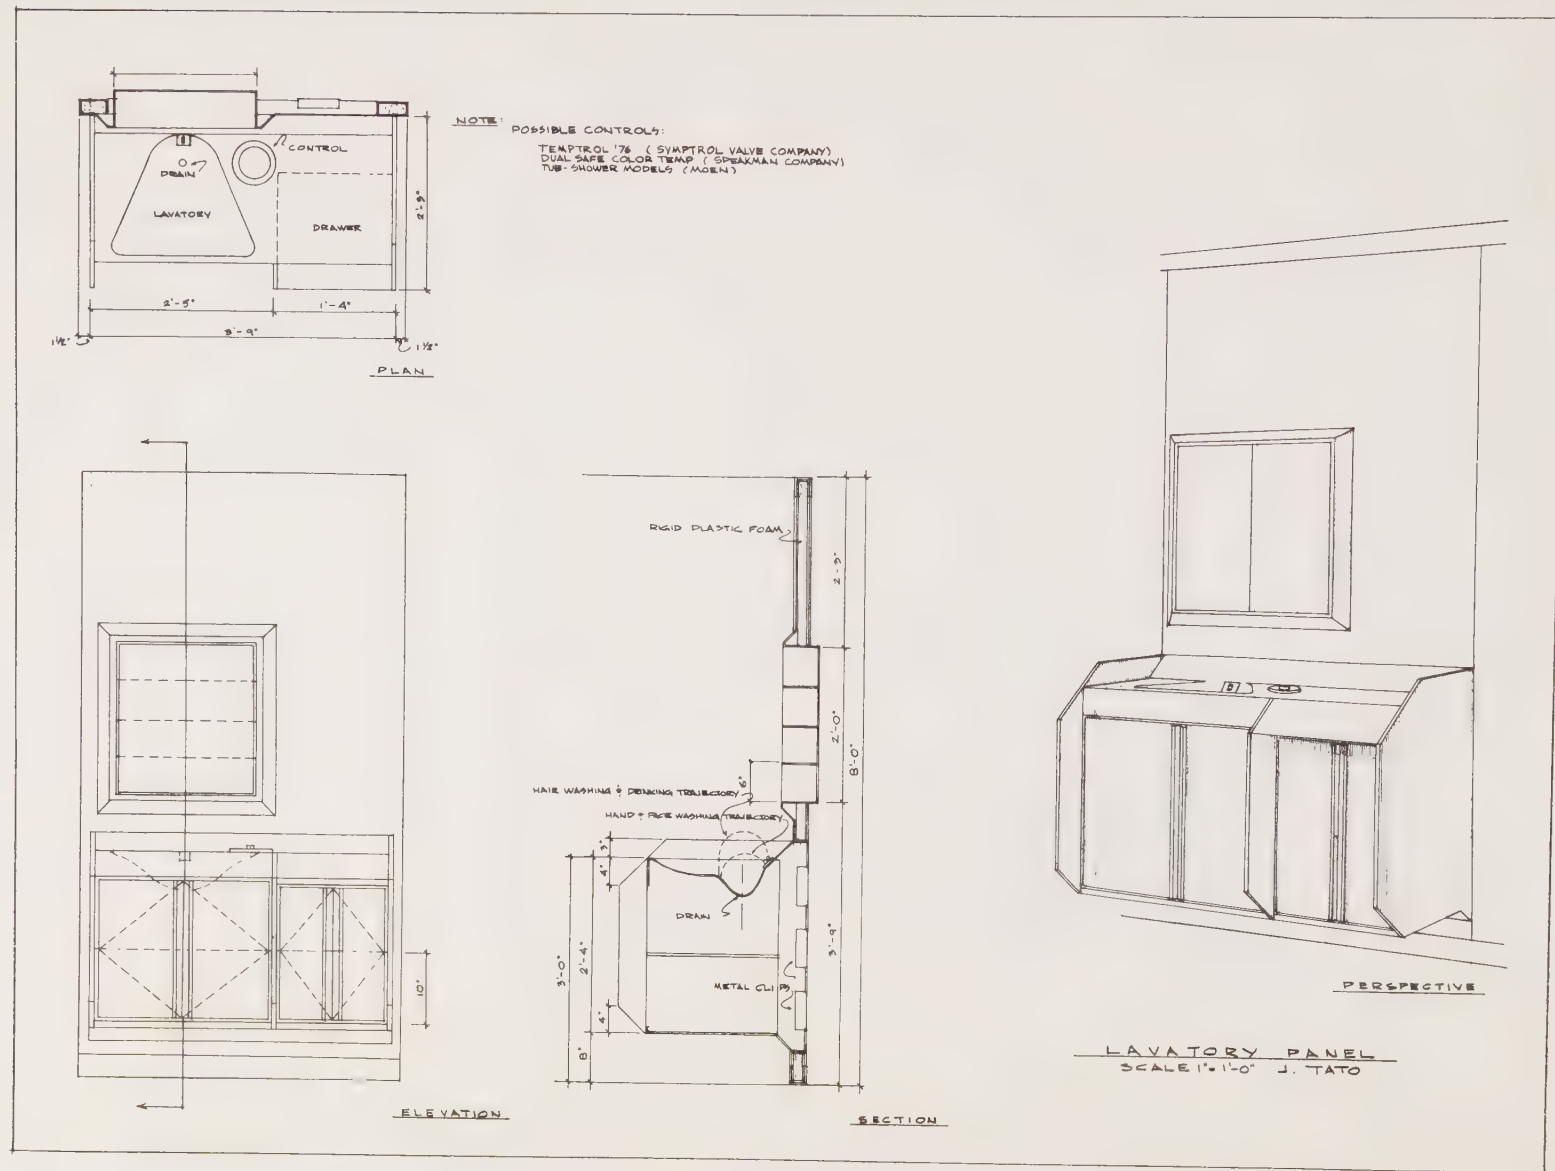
BATHROOM SUBSYSTEM - LAVATORY PANEL
